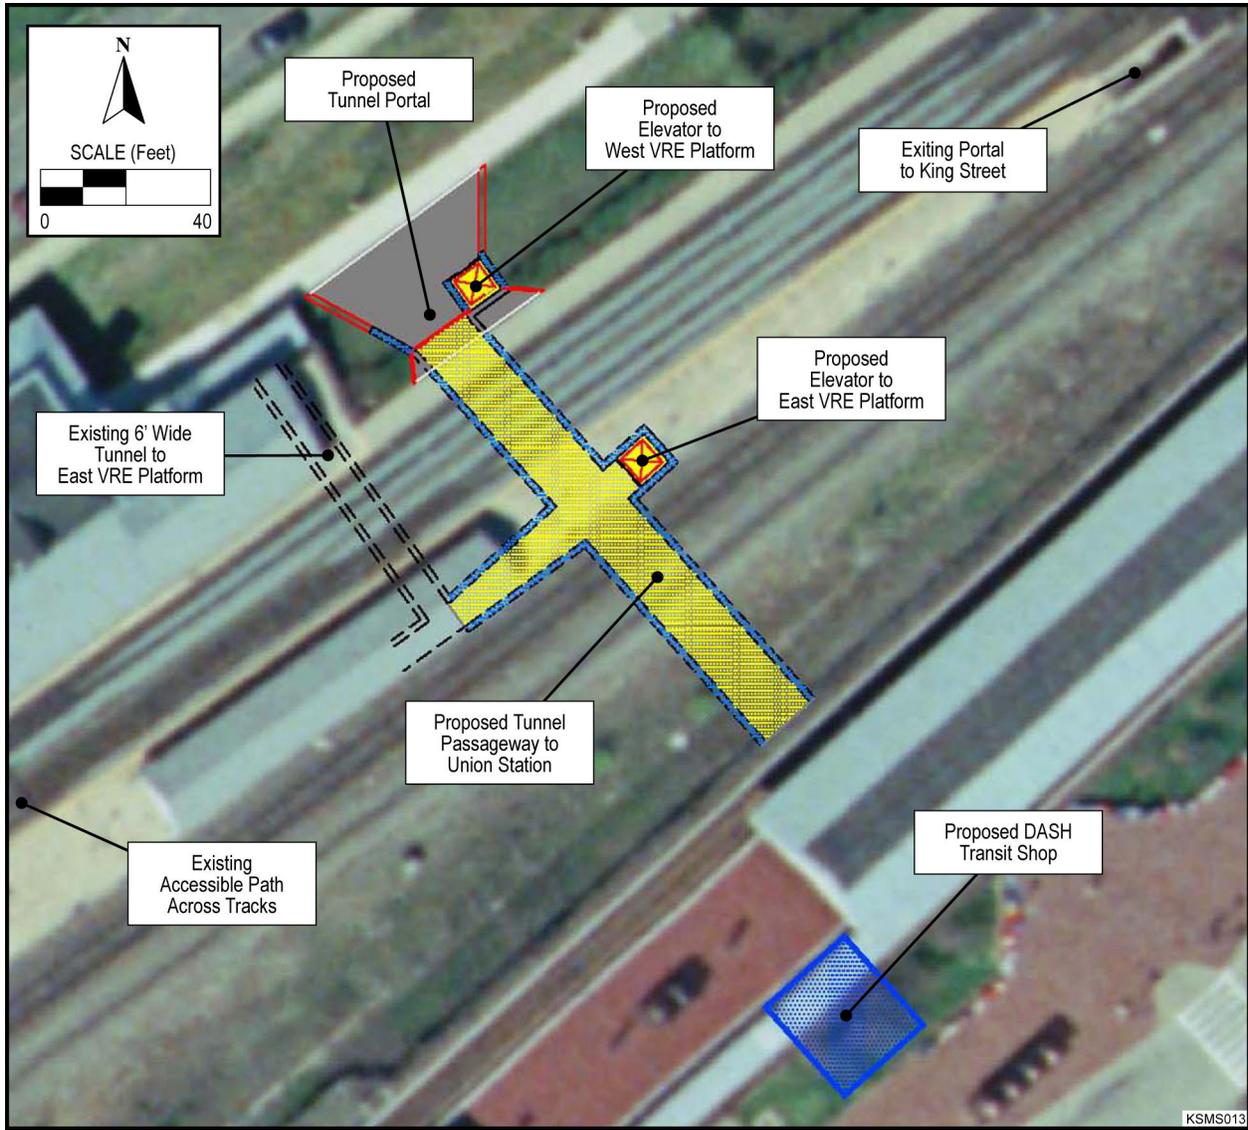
Aerial Plan – Union Station Tunnel Passageway Connection
